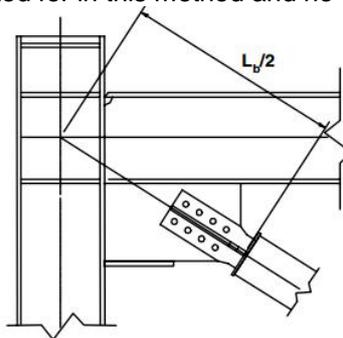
Connection length used for Working Point Method (Tsai et al. 2002)
